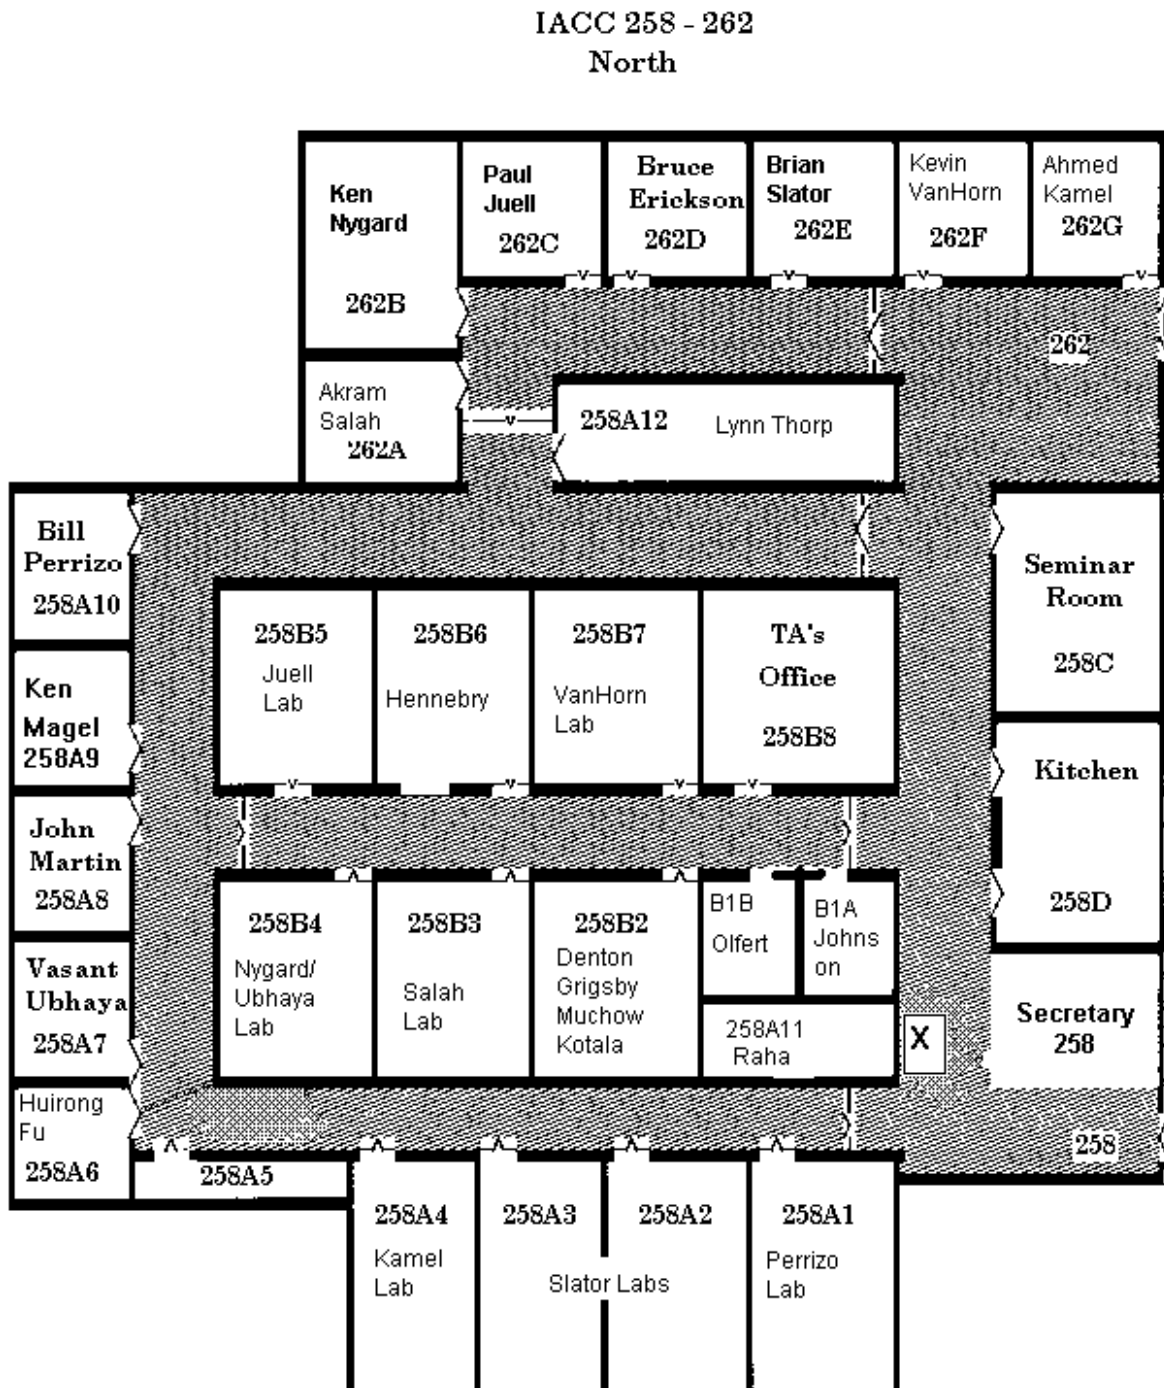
the Department of Computer Science floor plan in 2002 shows 12 faculty offices, 9 research labs, 1 systems office and equipment room, 1 TA Office, 3 instructor offices, 1 seminar room and a kitchen. Connecting hallways made communication and navigation simple and straightforward.
